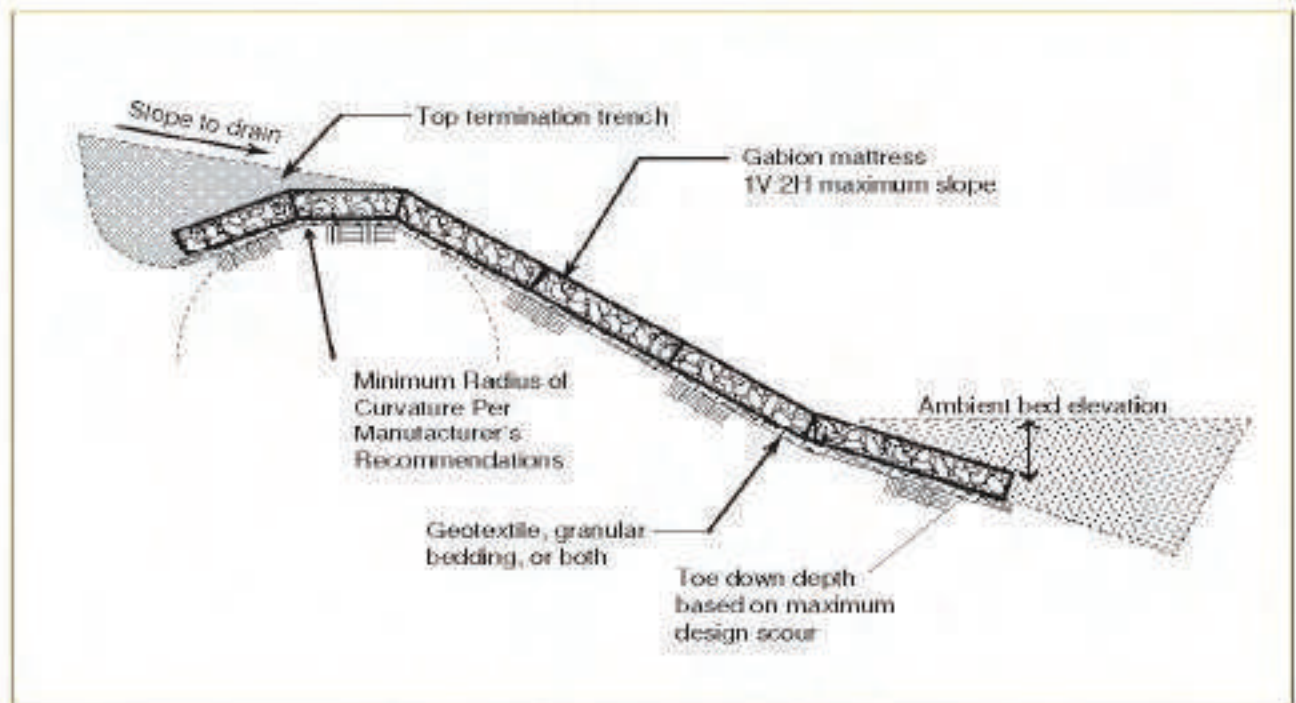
Suggested Installation Detail for Gabions Used as Bank Revetment
